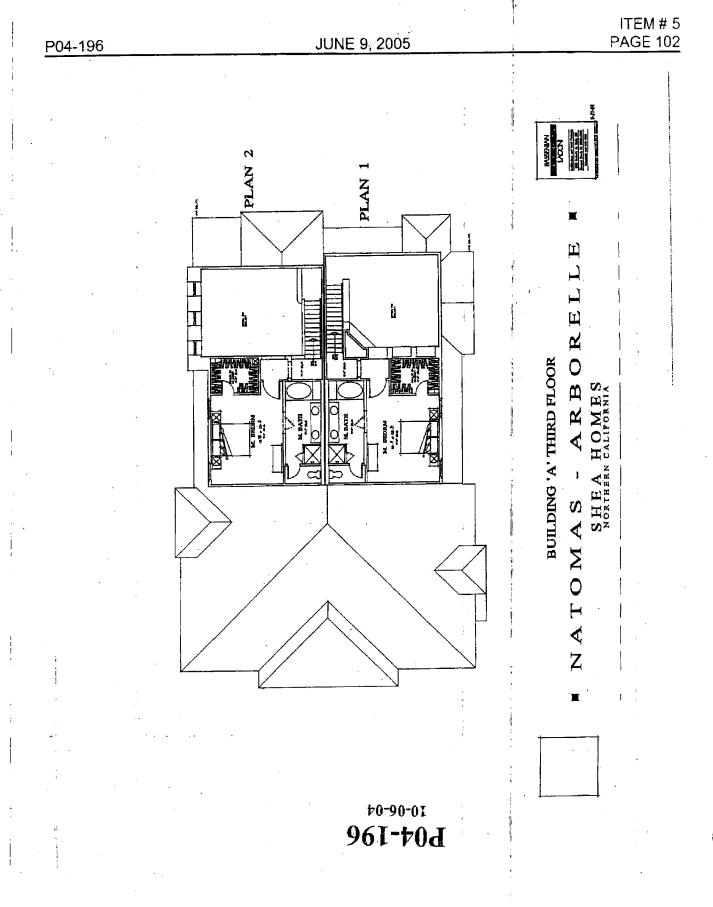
K - Arborelle - Building A - Floor Plans and Elevations
